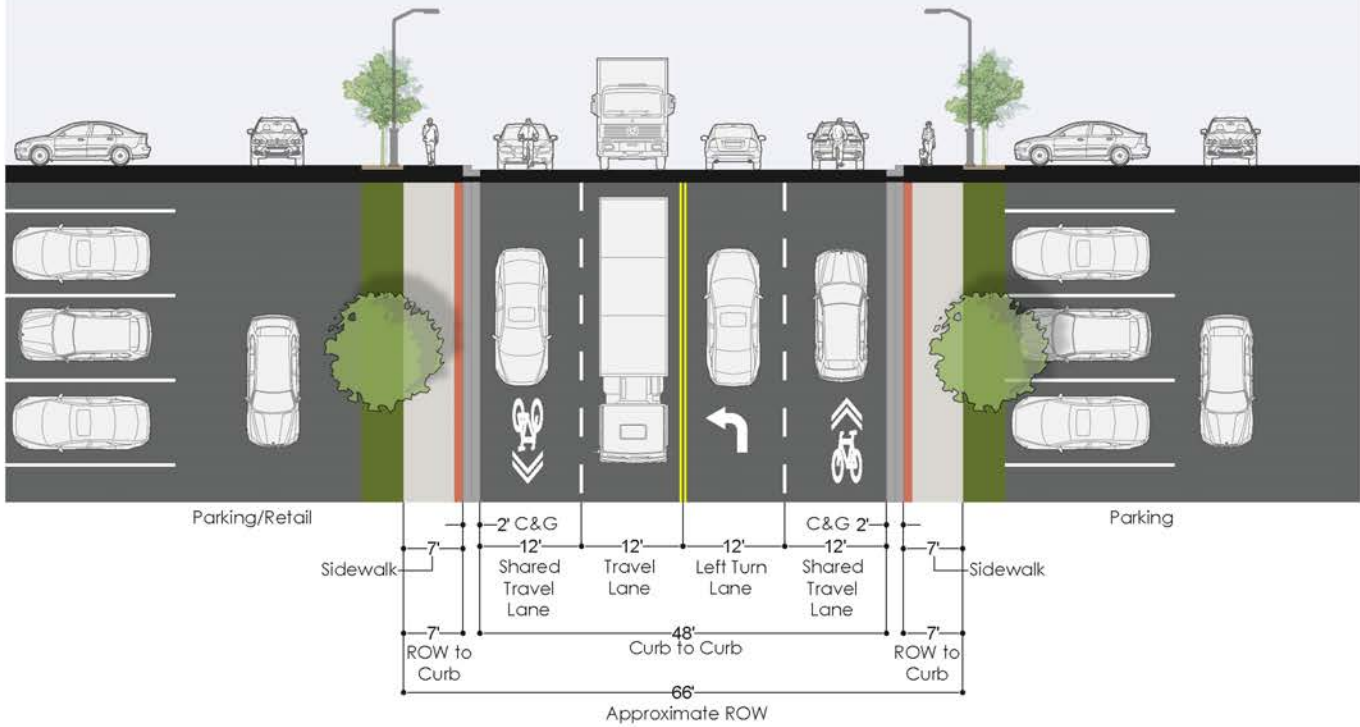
Existing Typical Section - Monocacy Boulevard to South Street
